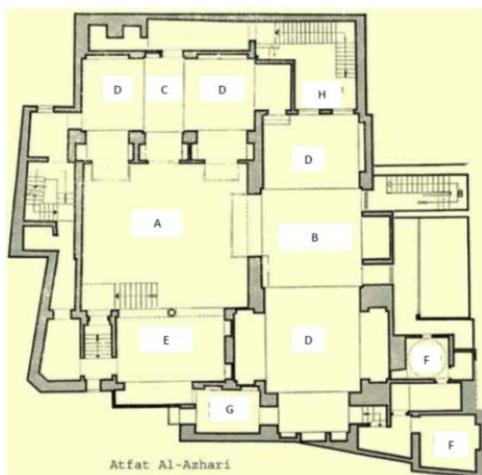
House of Zainab Khatoun, Ground Floor Plan (1468 AD) [5]
